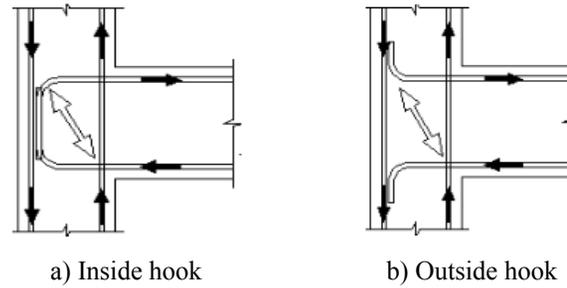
Exterior joints with beam's bars bent inside and outside (Kuang et al., 2006).
